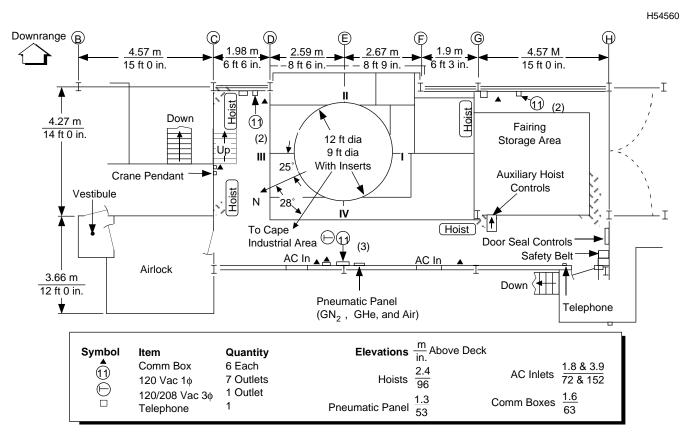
Level 9B Floor Plan, Pads 17A and 17B
